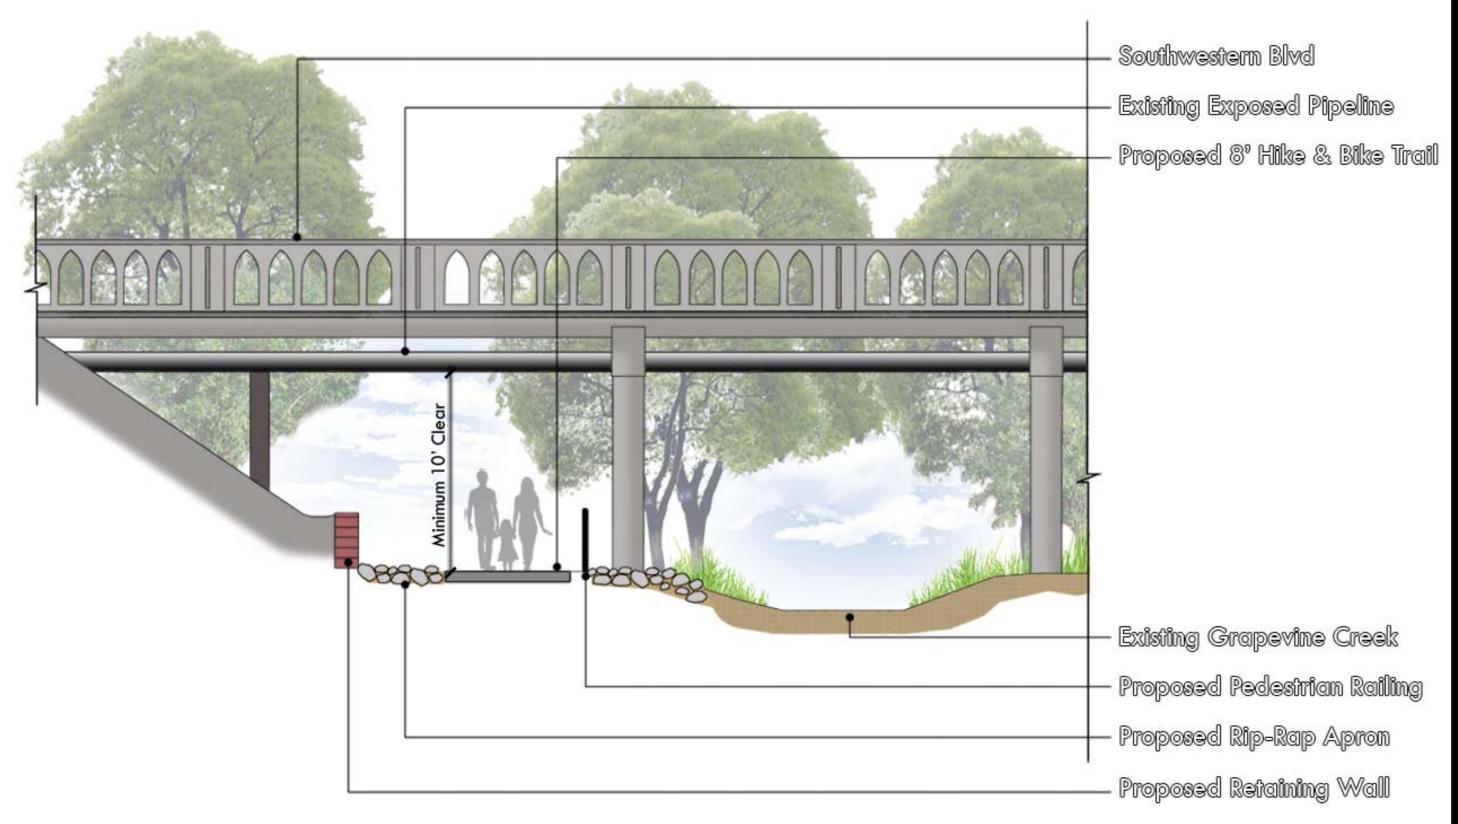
Grapevine Springs Park Proposed Connector Trail - Southwestern Blvd. Section
